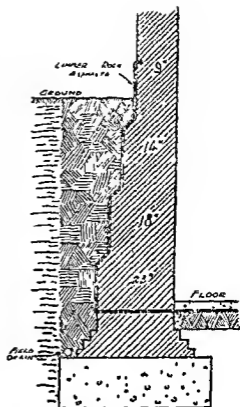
Type of retaining wall for a building with very high adjoining ground. The damp-proof course is carried under all the floor and jointed carefully to the vertical asphalt.
